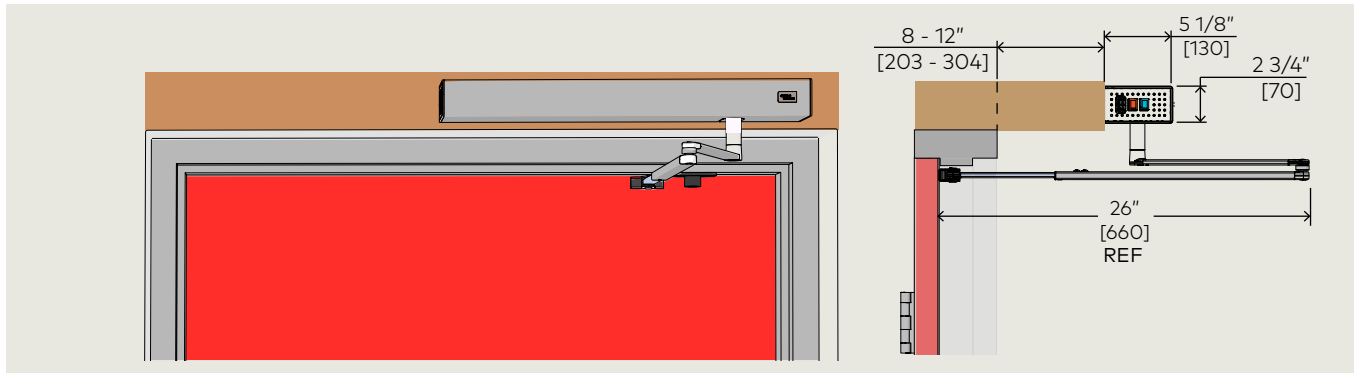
ED900 T – Track mount installation – RH pull
